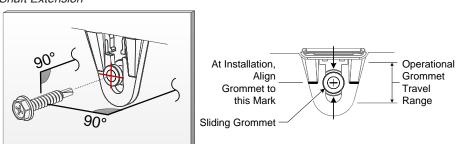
Supplied Mounting Hardware – Drive the screw at a right-angle to the VAV Box
